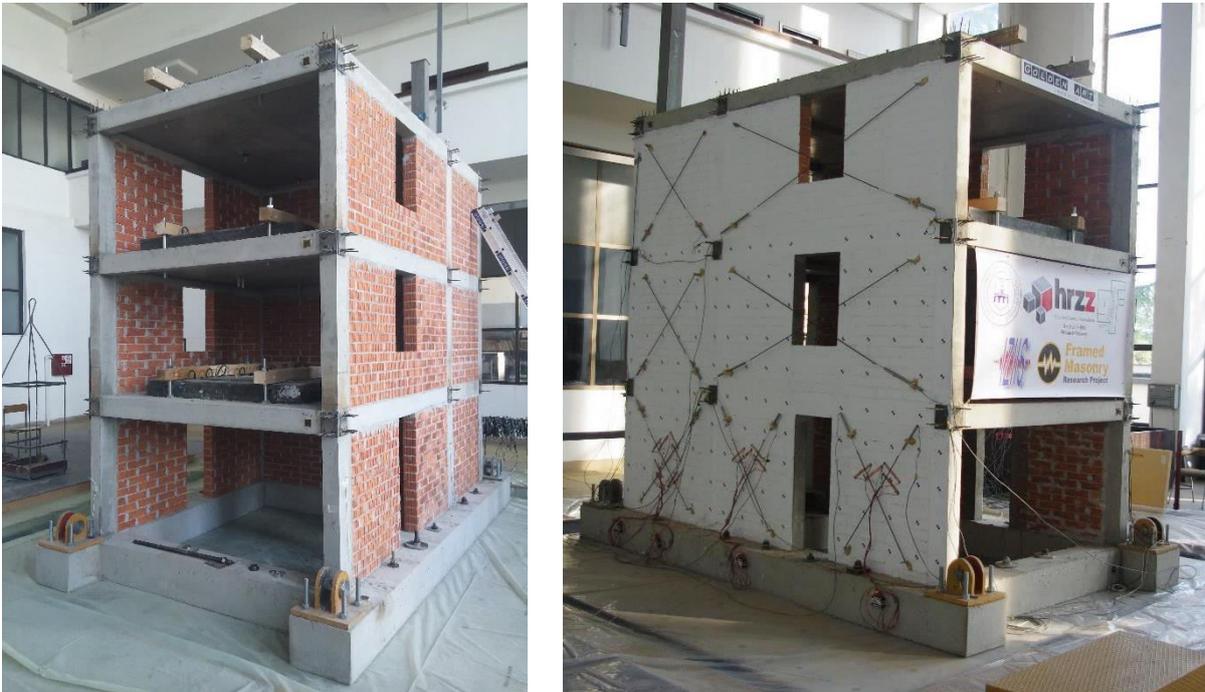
Structures on the shaking table before testing: (left) Series 1, with hollow clay block masonry and no vertical confining elements, and (right) Series 2, with solid masonry and confining vertical elements.
